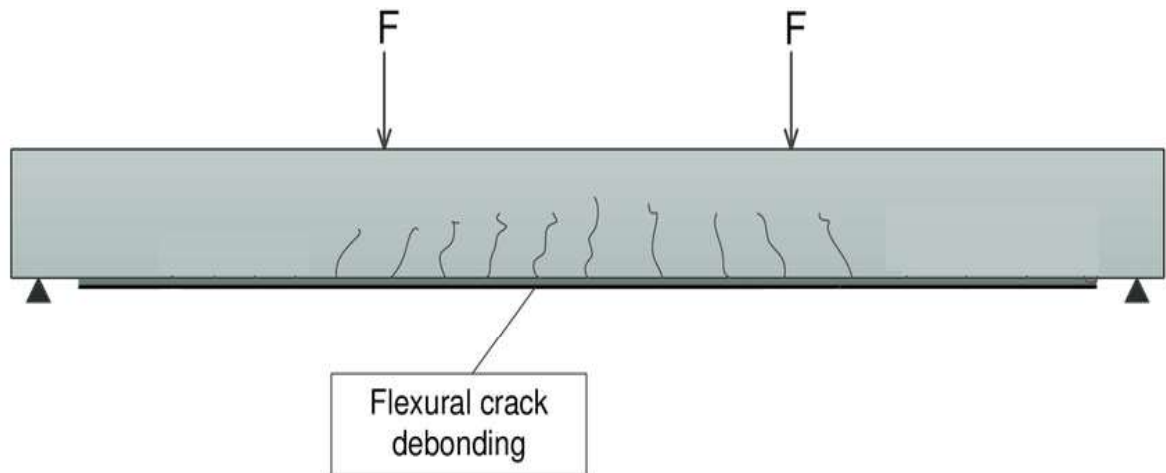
Proposed Failure of Flexure in reinforced concrete beam in current Study.
